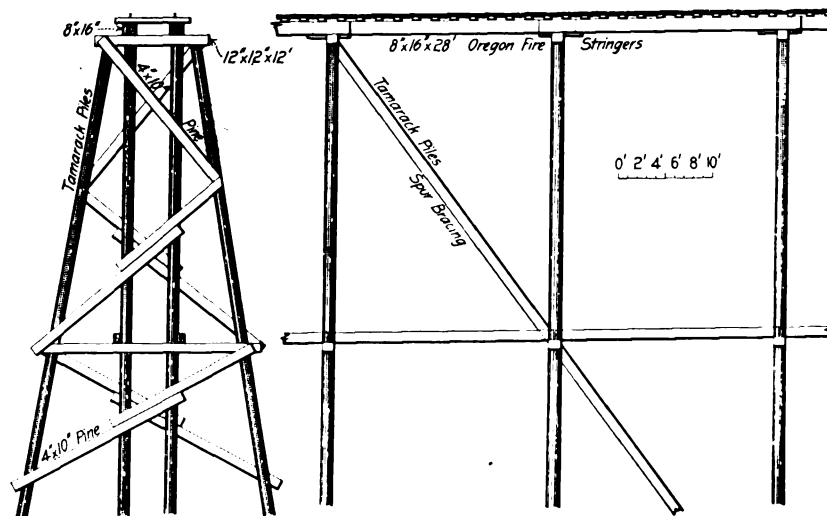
TEMPORARY TRETTLE FOR CONSTRUCTING HIGH EMBANKMENT.
